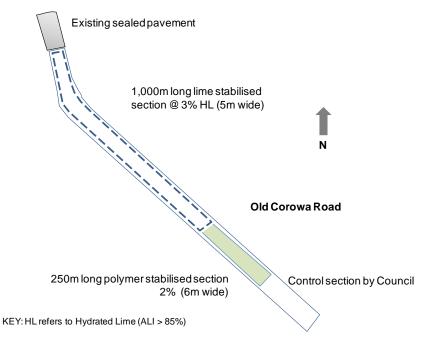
Plan view of stabilised section for Old Corowa Road, Jerilderie.
